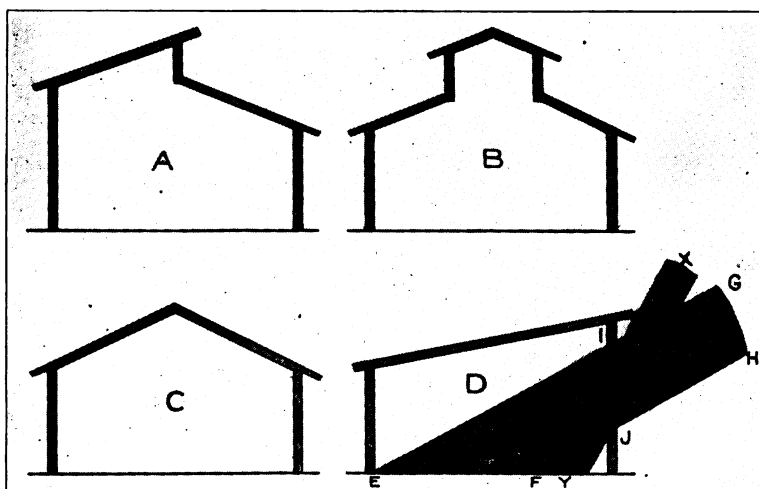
Styles of roofs commonly used in poultry house construction. A, semi-monitor roof; B, monitor roof; C, gable roof; D, single span or shed roof. Of these four styles, the shed roof is the most economical and most practical for a poultry house. Chief among its advantages are that it admits a maximum amount of sunshine during the winter months. I J represents a window on the south side; E F represents portion of the floor which the sun will shine on in December, and X Y, the portion of the floor which the sun will shine on in May.
